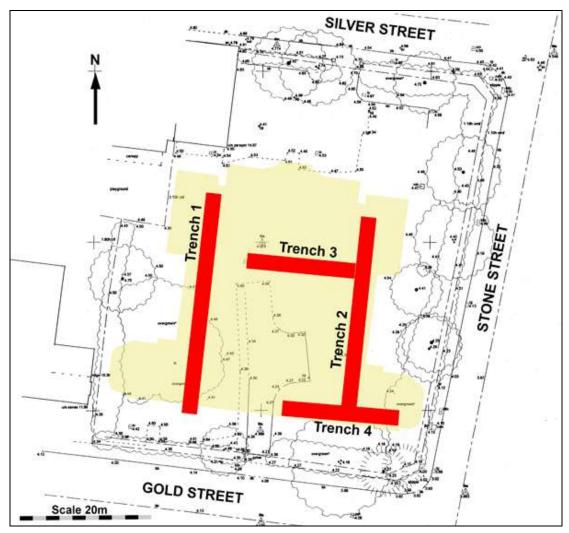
Plan of the evaluation trenches. The outline of the new building is indicated in beige.
